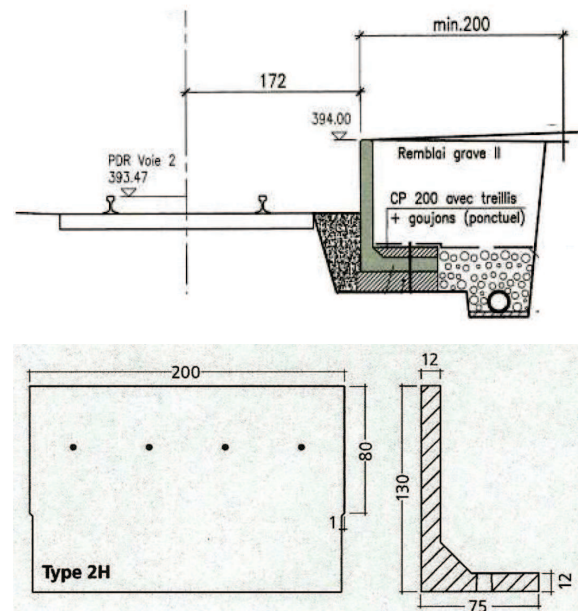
Principle of construction of the platform (typical cross section); dimensions of the L-shaped prefabricated RC elements.
